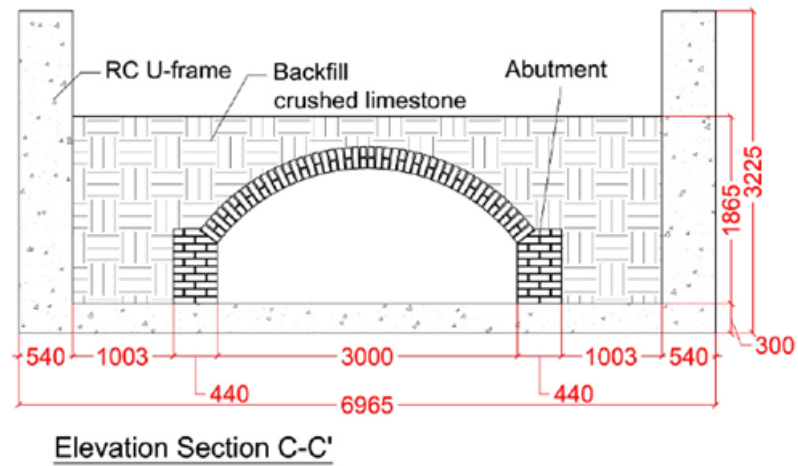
Dimensions of the test bridge section C-C' (mm) (Sarhosis et al., 2024)
